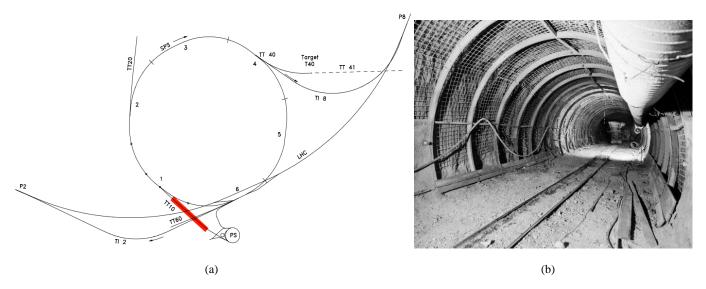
a) CERN underground network: location of TT10 tunnel b) TT10 tunnel excavation (Photo credit: CERN)
